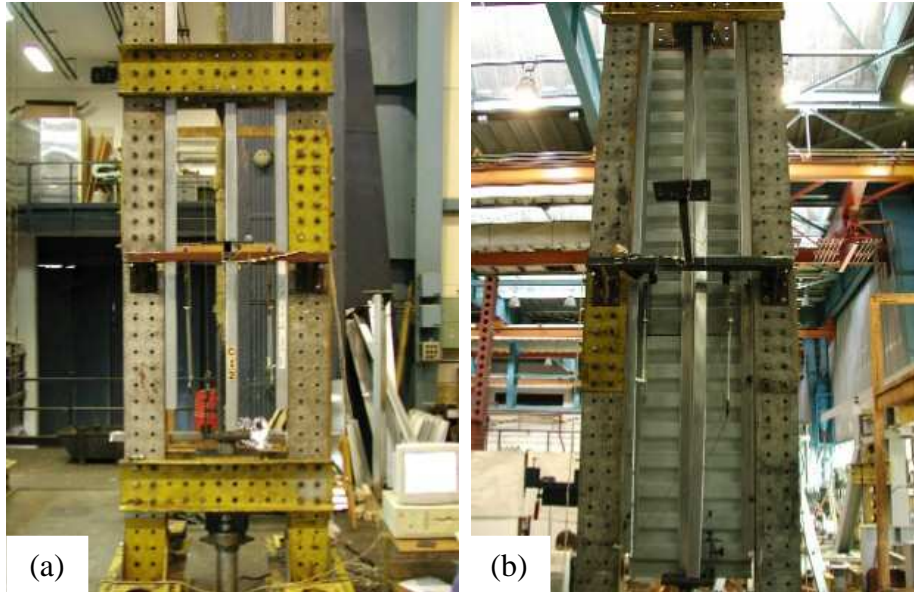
Test setup: (a) global test arrangement and (b) lateral supports by trapezoidal sheet on Z-section specimen
